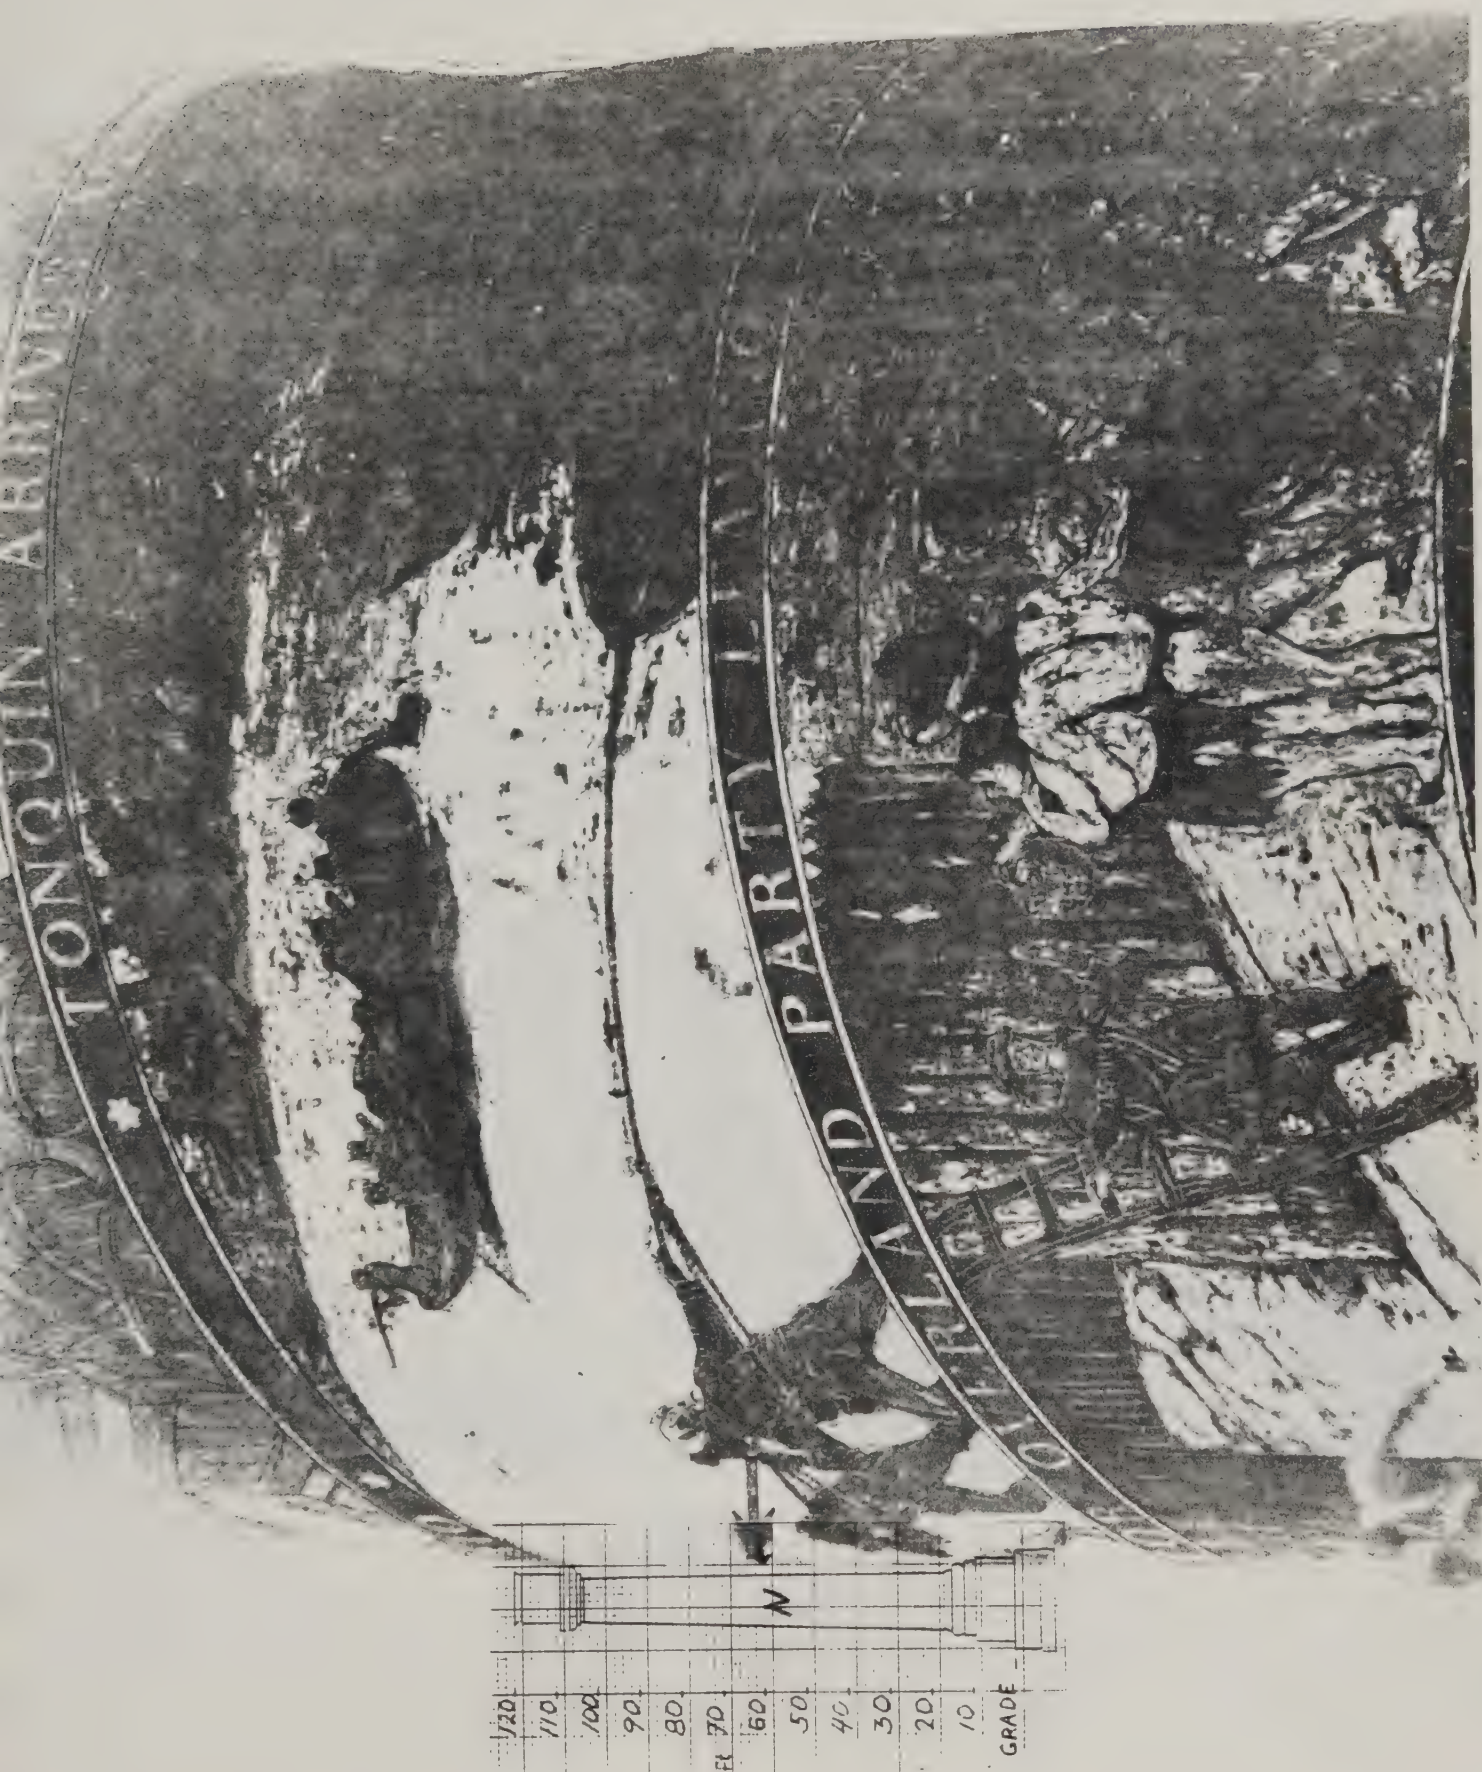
Photo Astoria Column North Face Section-OCT 1989
